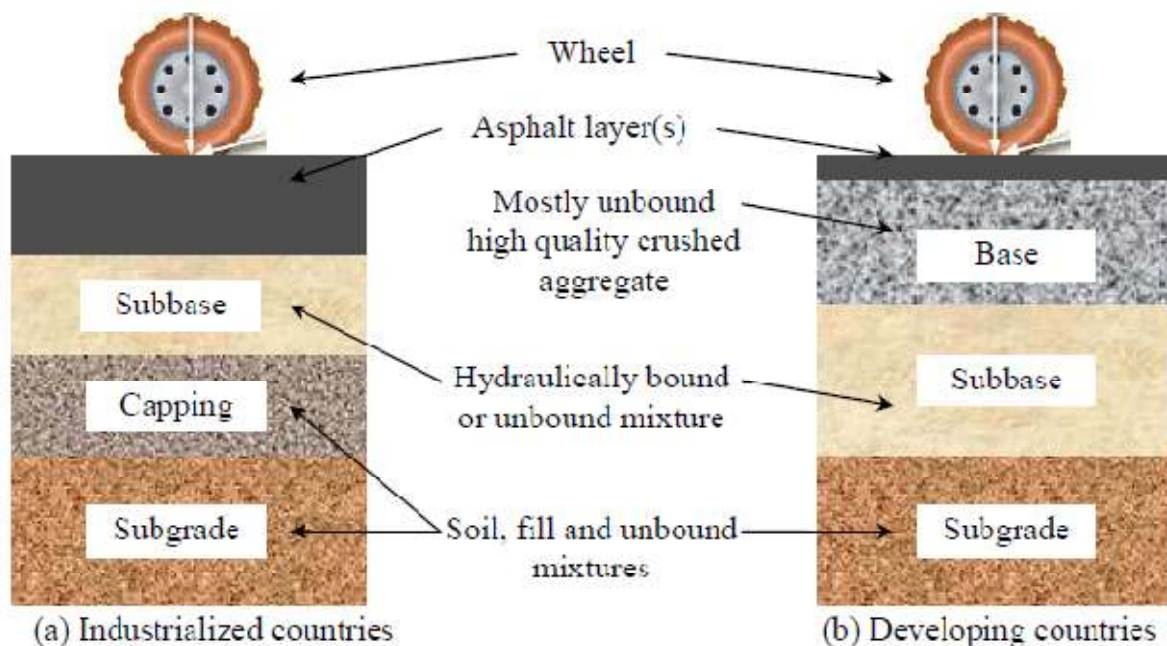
Schematic pavement structure, typical sections and material options (Araya, 2011)
